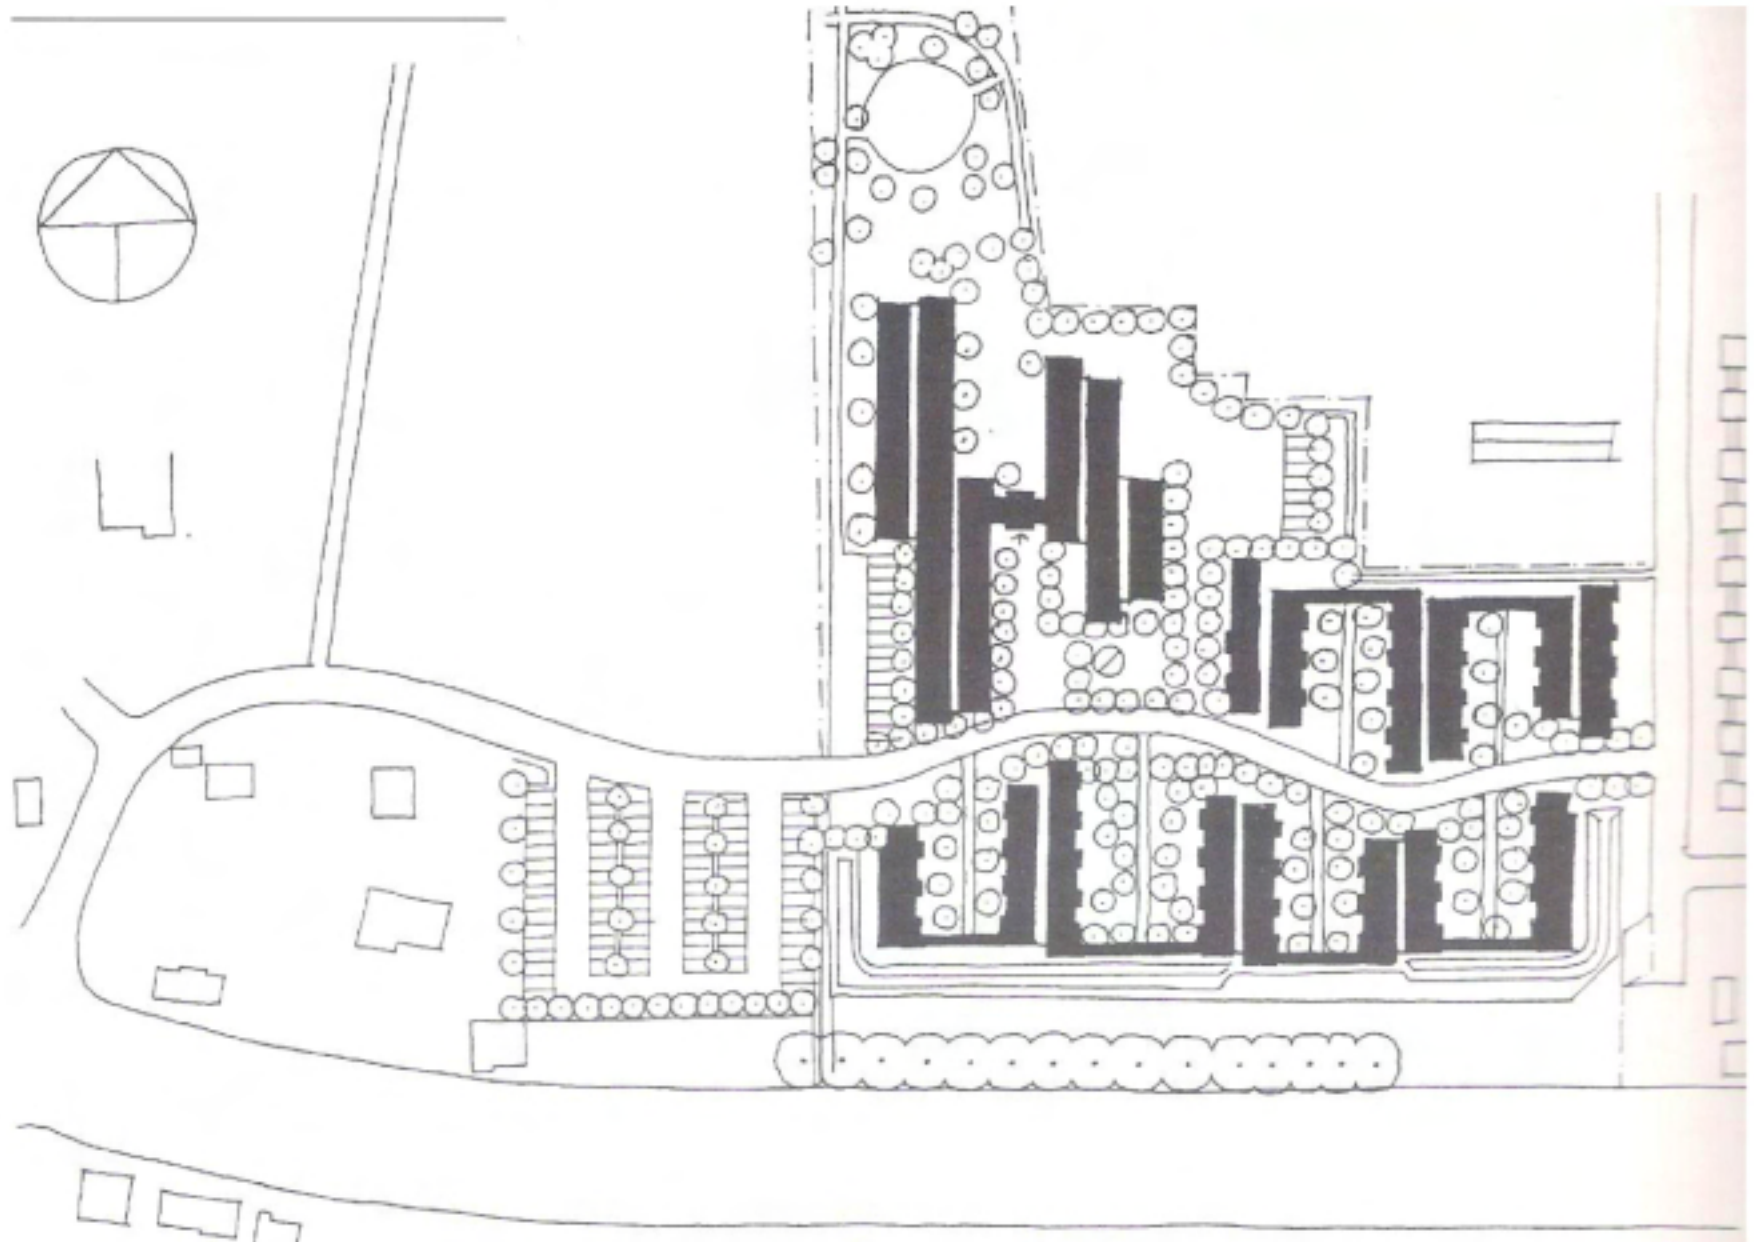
Combination of single bar and 'u' shaped units. Site Plan [Colquhoun Pg. 200]
